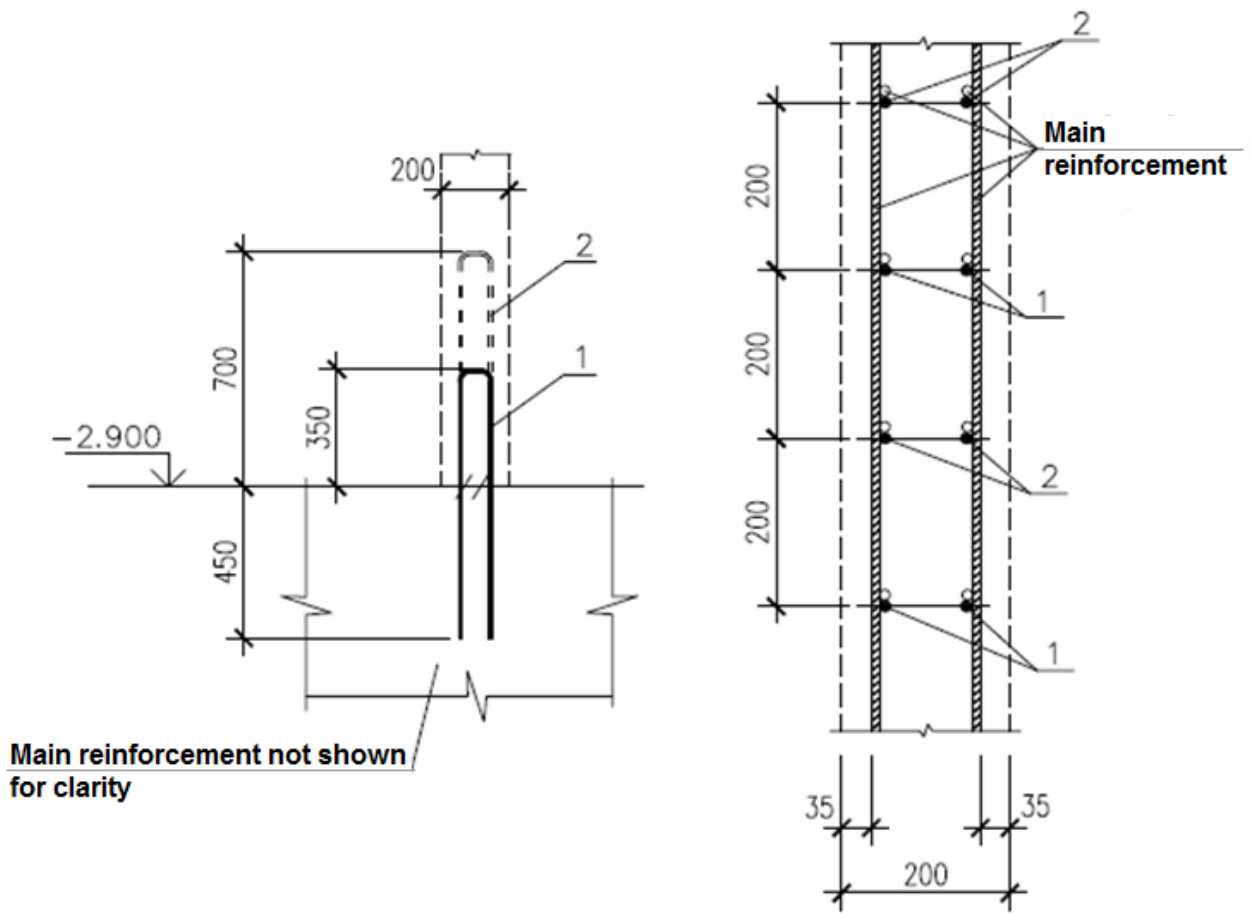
Example of reinforcement, Oland, Saint-Petersburg
